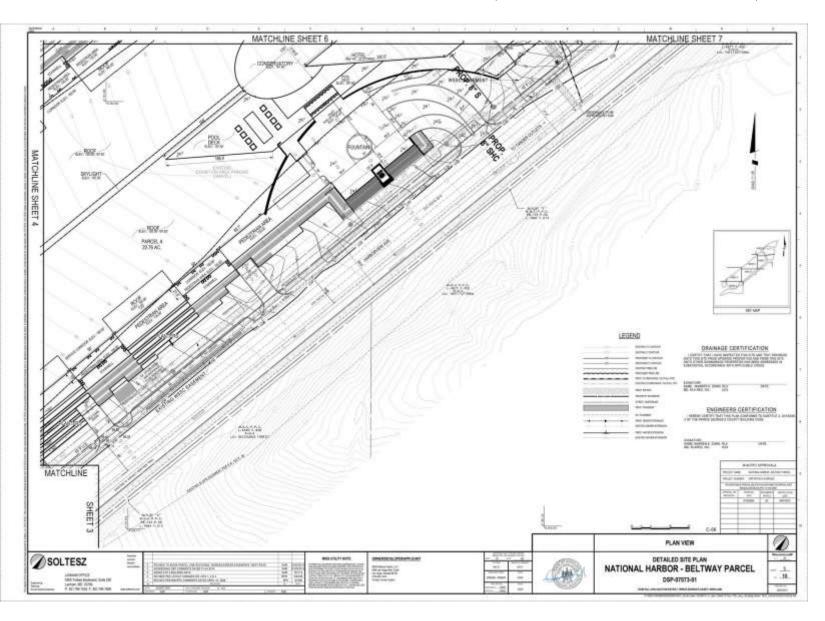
DETAILED SITE PLAN SET (PAGE 4 OF 10)
